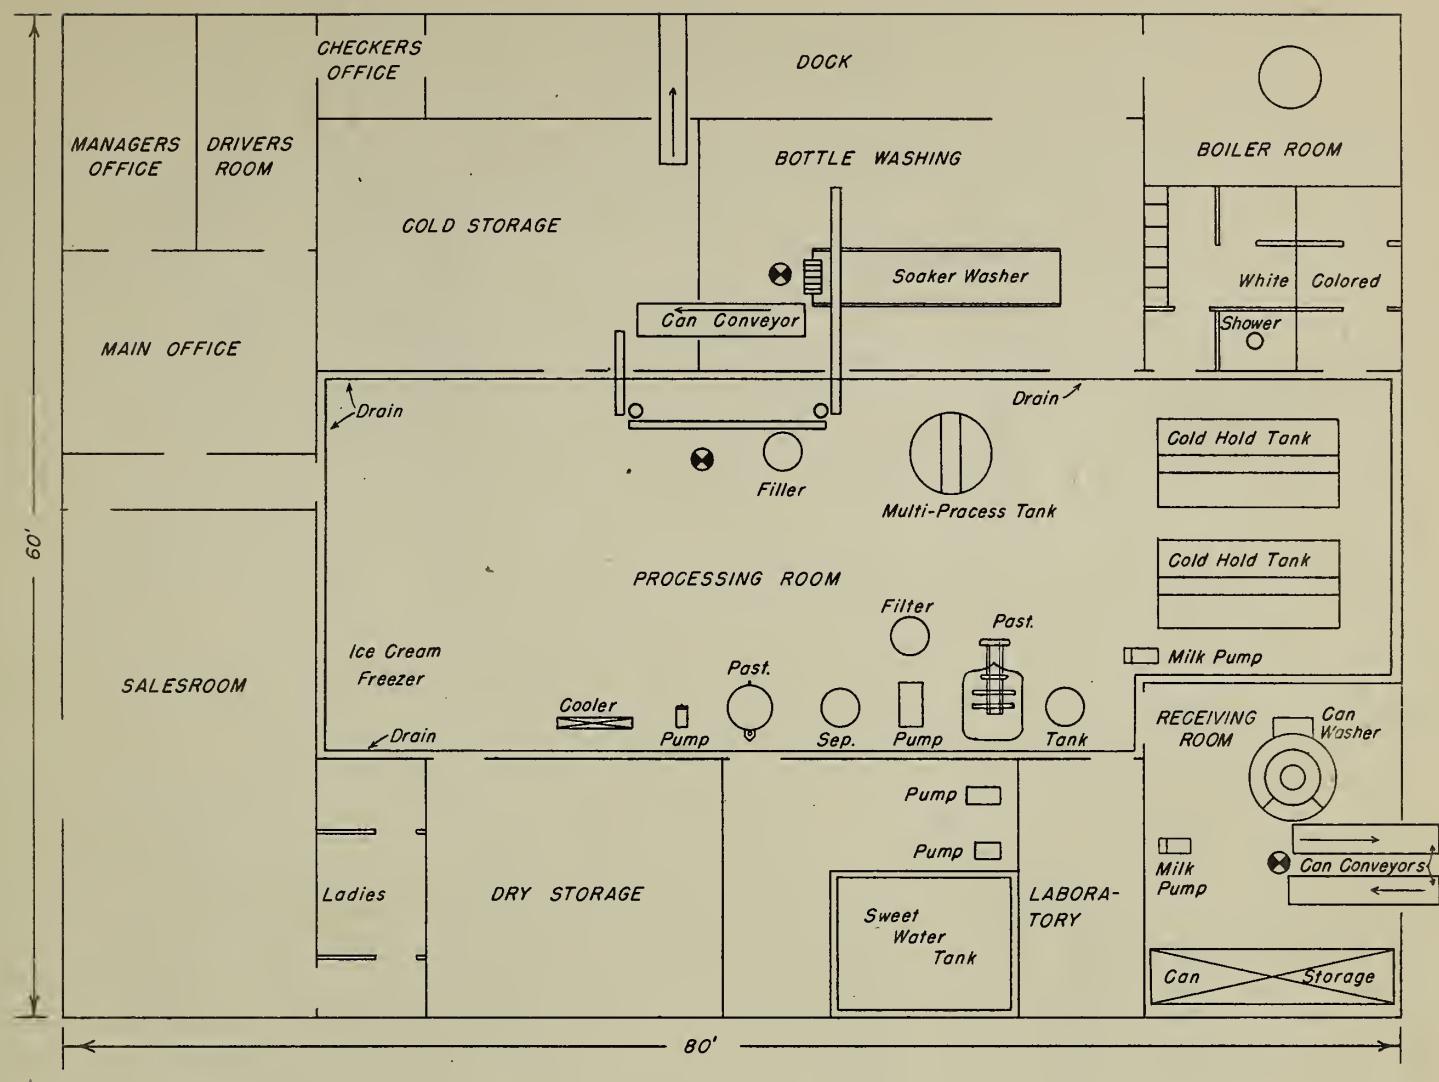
Work-floor plan of a large and well arranged plant. The second-floor offices and recreation room are not shown here.
